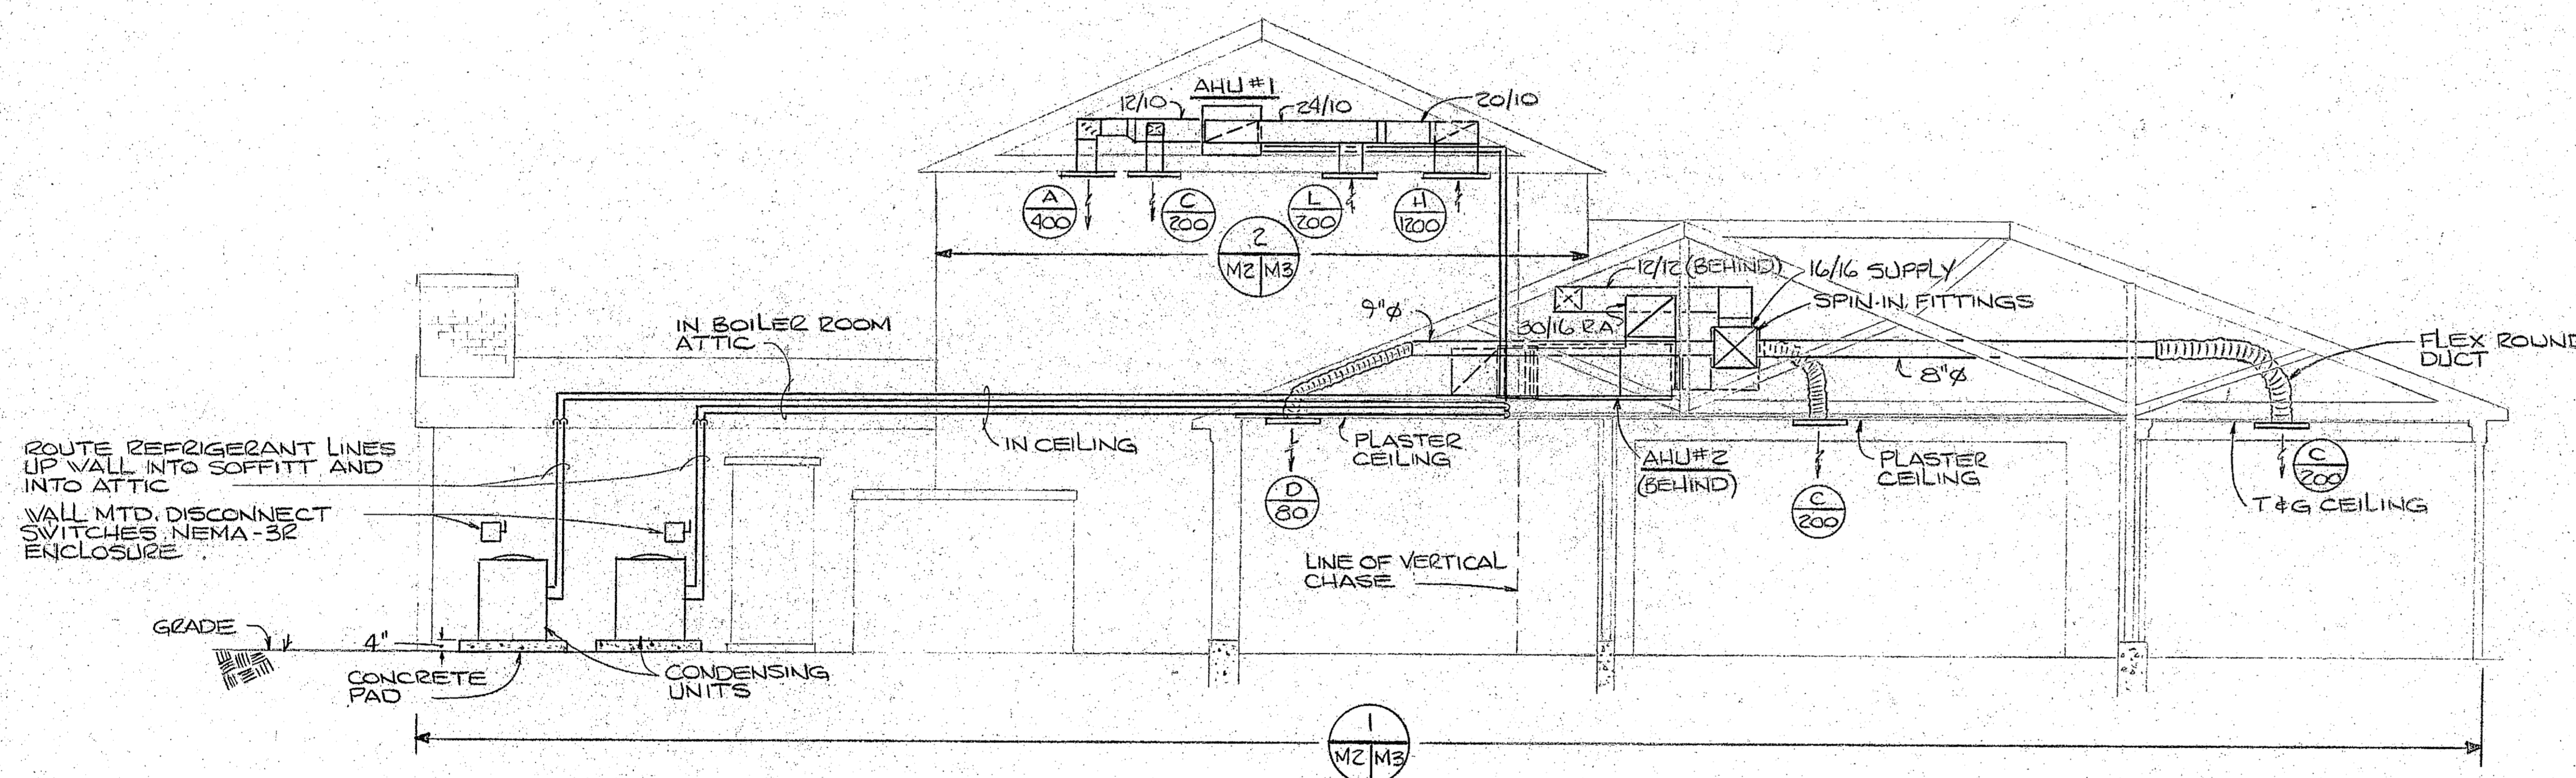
DETAIL OF DUCT ROUTING TO FLOOR OFFICES
